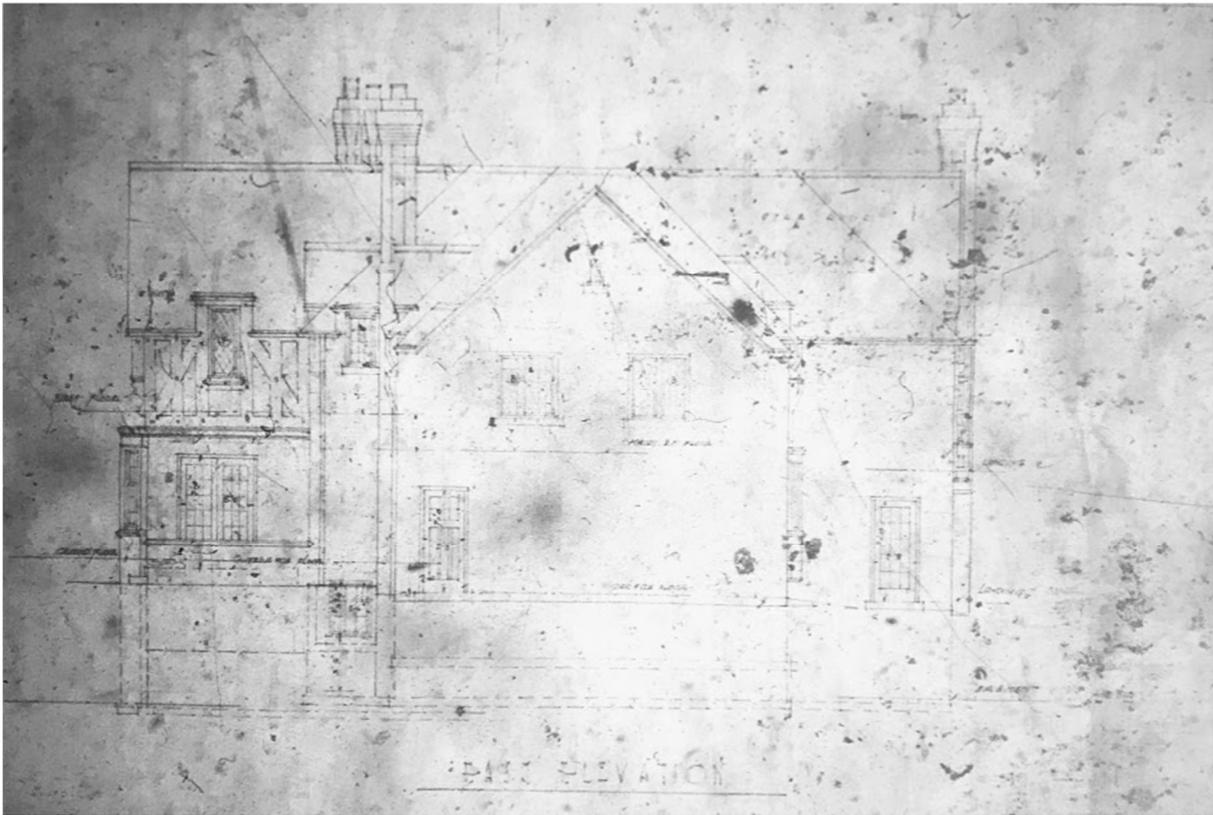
1934 architectural drawing by Douglas Kertland, showing the east elevation. (Building Records)
